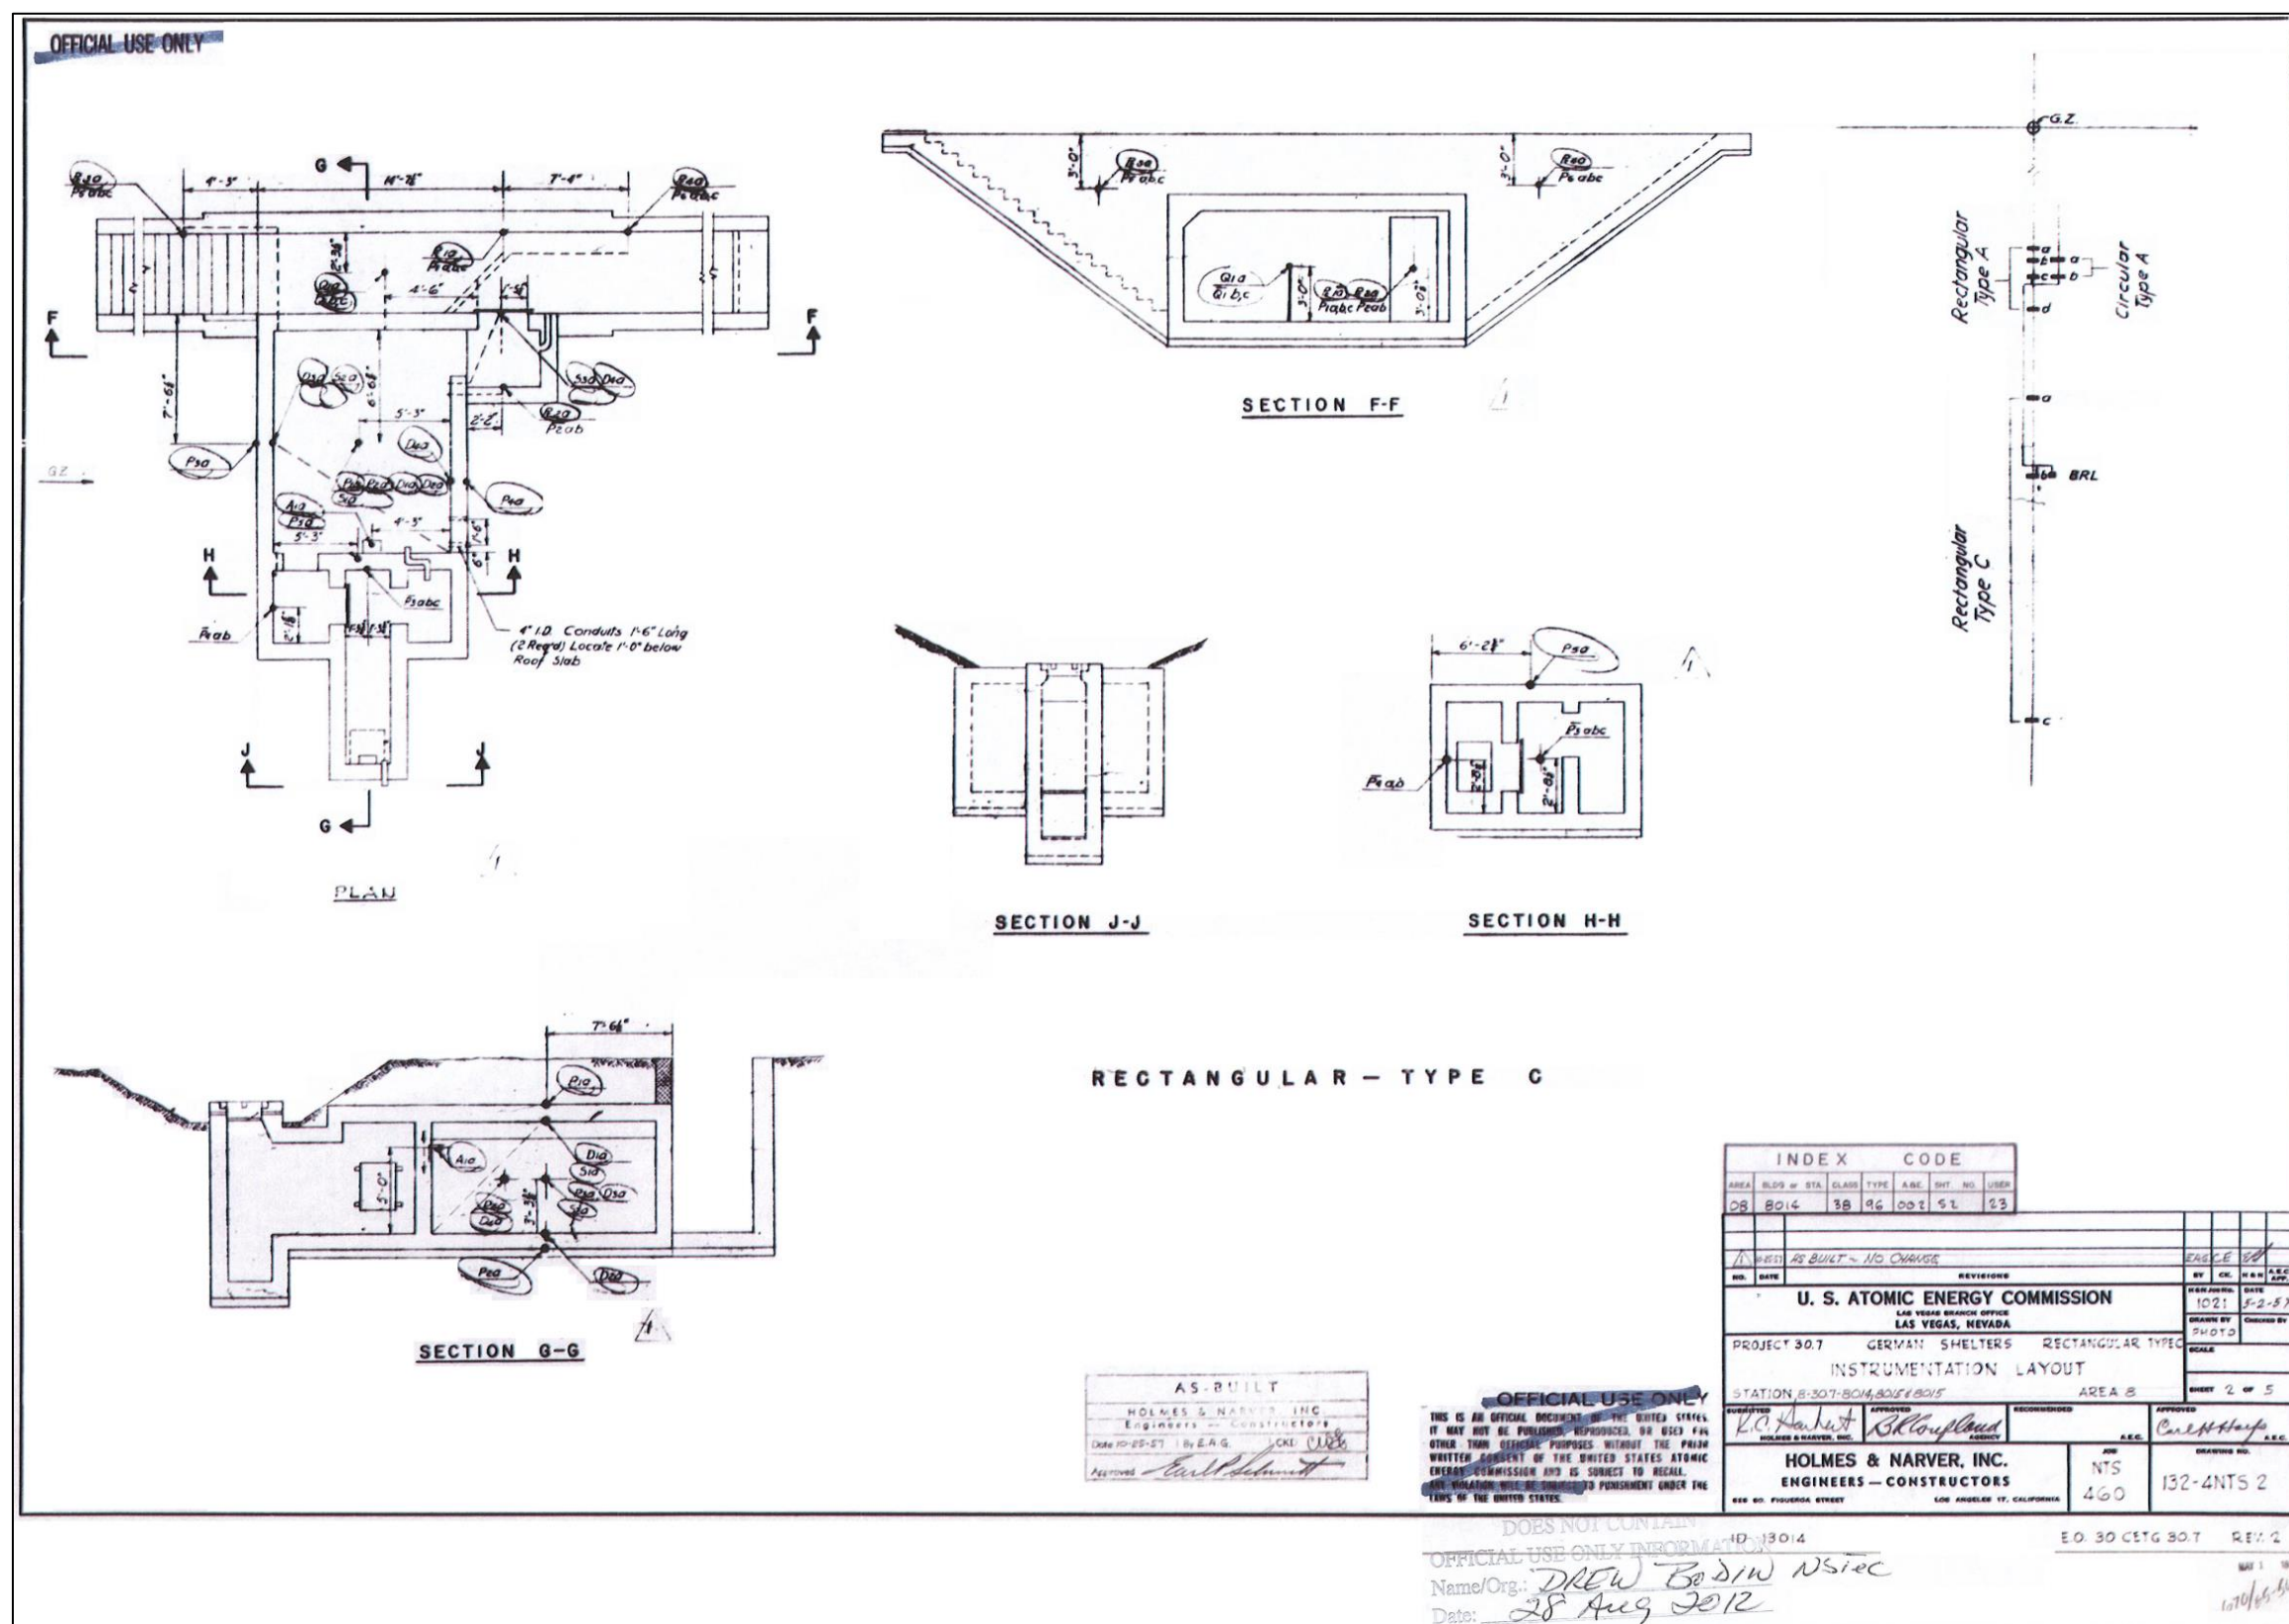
S917 and S918, German underground personnel shelters RCa and RCb, plan and sections.
